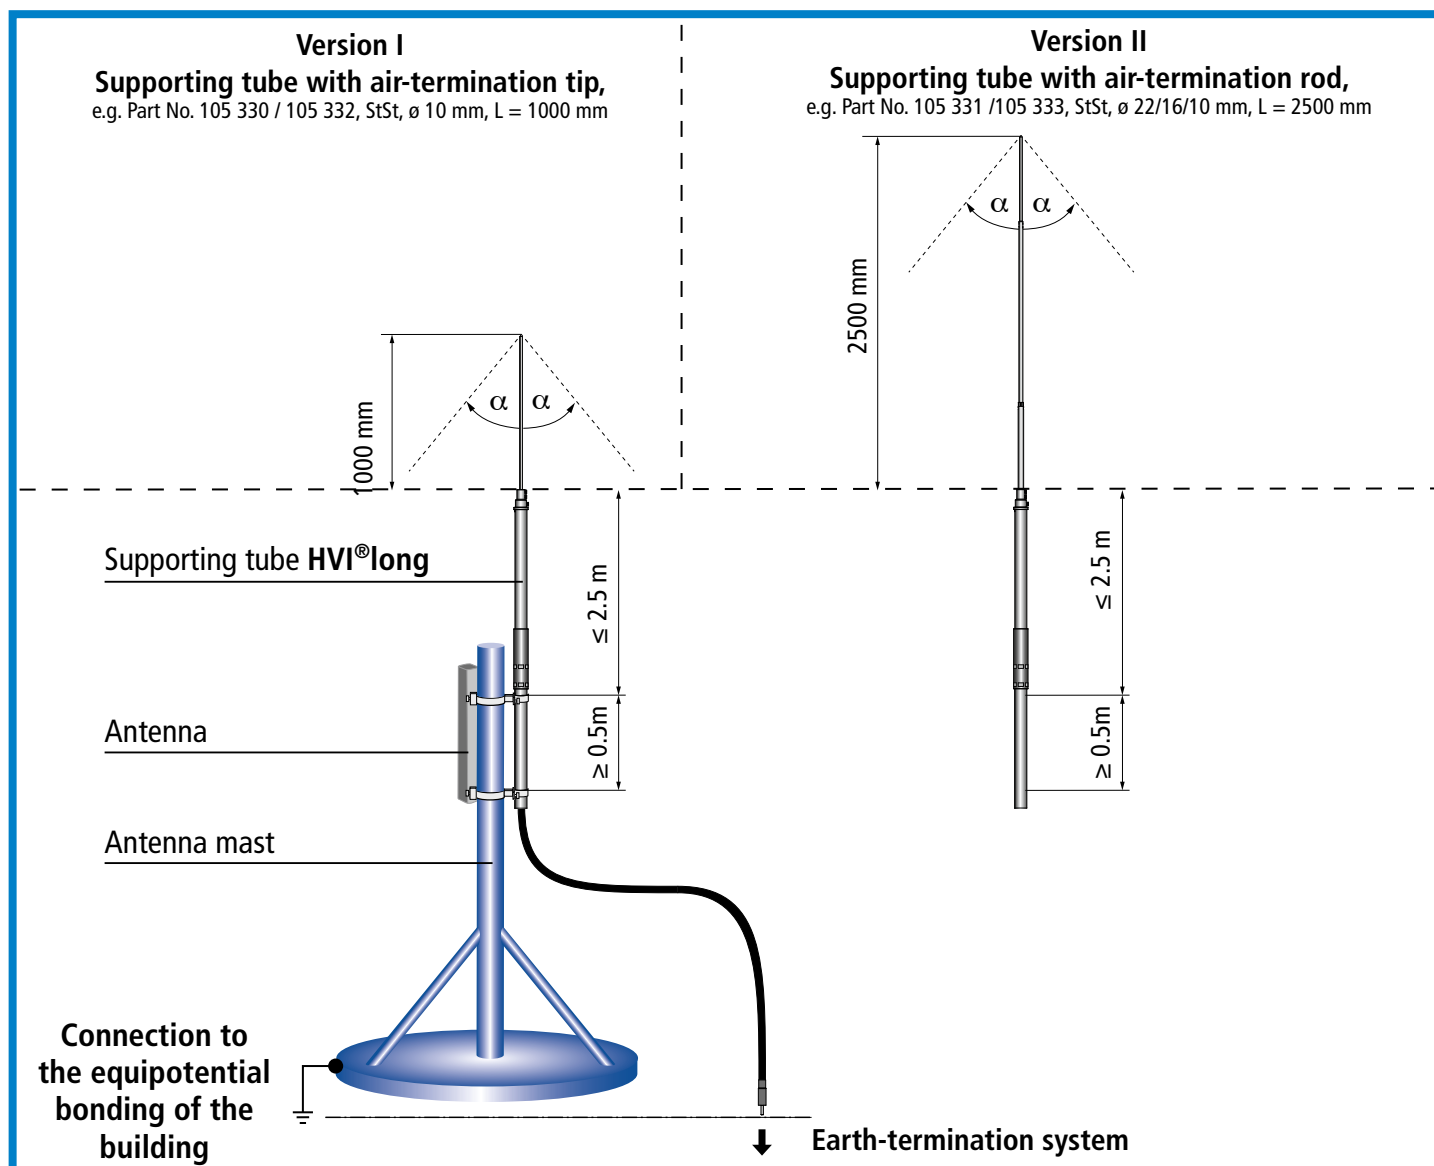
Wind speed – Versions I and II when attaching to the supporting tube
